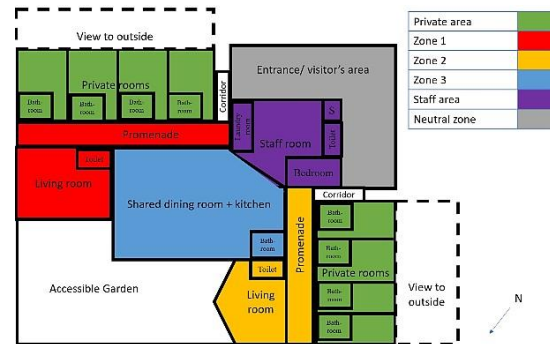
Conceptual design (plan) for zoning in building. Private area: Private rooms/ isolation rooms; Zone 1/2: Communal space zone 1/2; Zone 3: Communal space that can be added to zone 1 or zone 2; Staff area: Staff room + functional rooms; Neutral zone: Zone where direction towards zone 1, zone 2 or staff area is determined.
